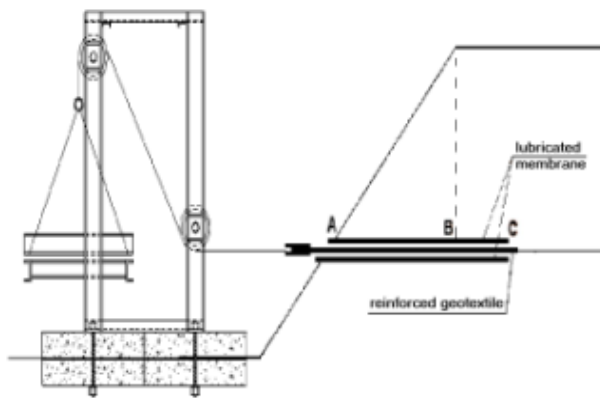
Lateral view of the loading frame and longitudinal section of the fill.
